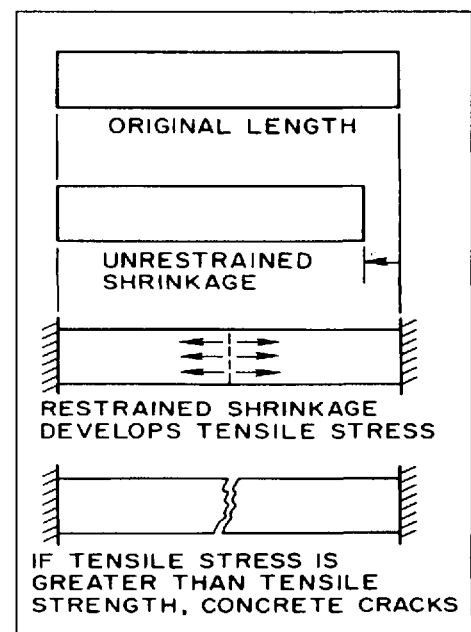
Cracking of concrete due to shrinkage under restraint [1]
